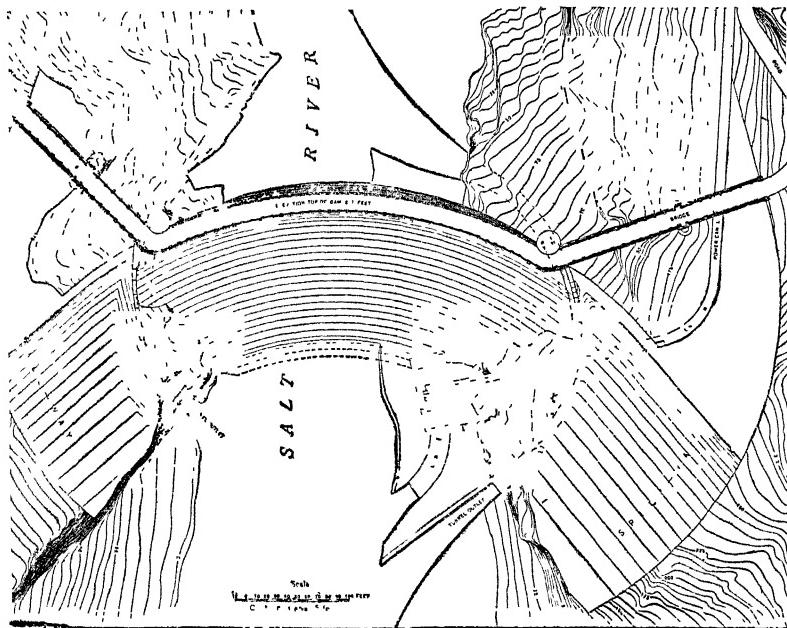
Plan of Salt River Dam, Showing Location of Power House, Power Canal, Tailrace, and Contour of River Banks
